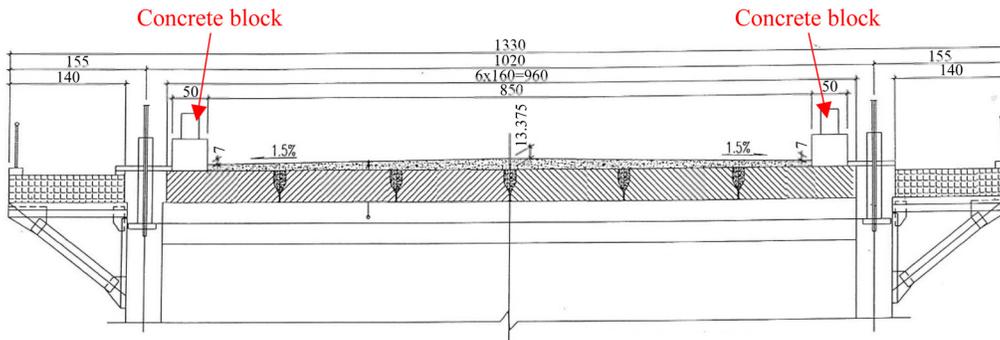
Concrete blocks for original bridge railing (drawing of bridge cross section).
